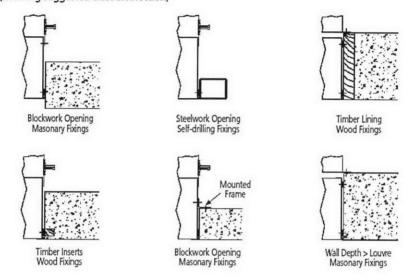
Multi Section Louvre Assembly MSW / MSH
